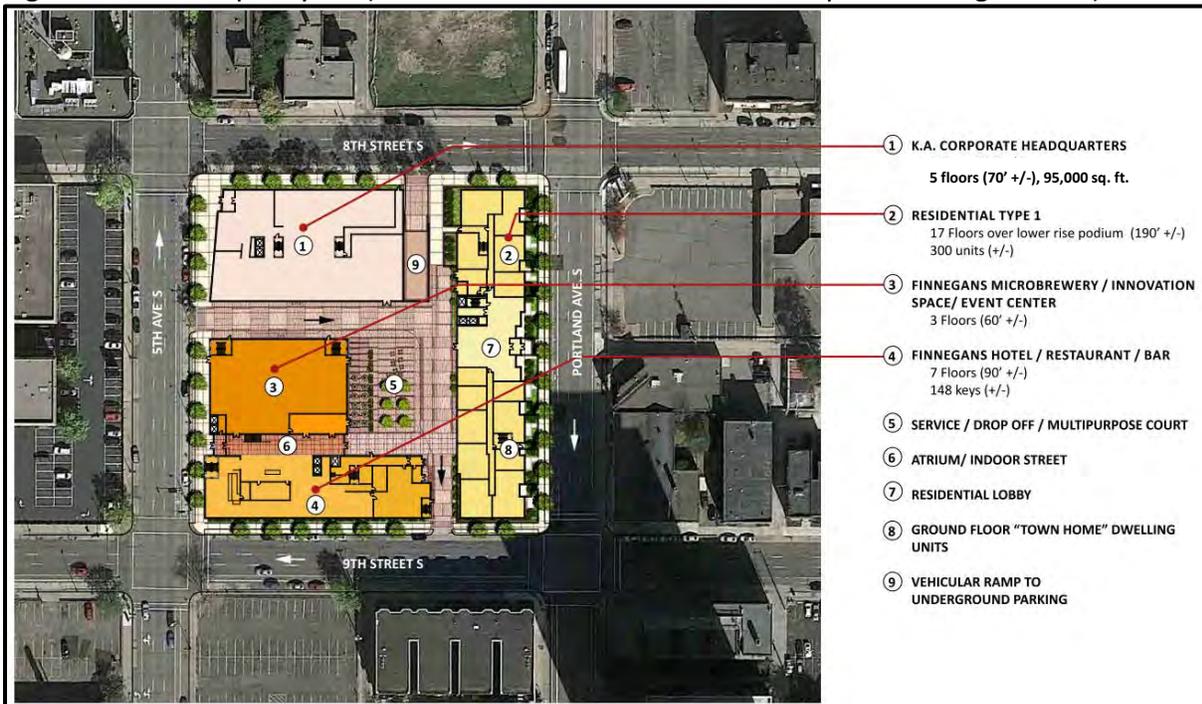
Concept Layout (Source: Block Mixed Use Redevelopment Design Vision)
